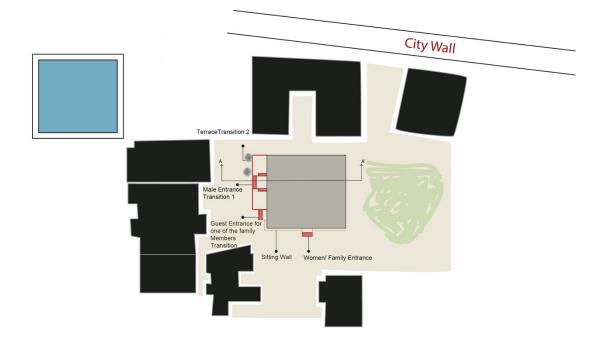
Indicating the visible thresholds in the plan and their relationship to the street and surrounding buildings. Source: Author.
